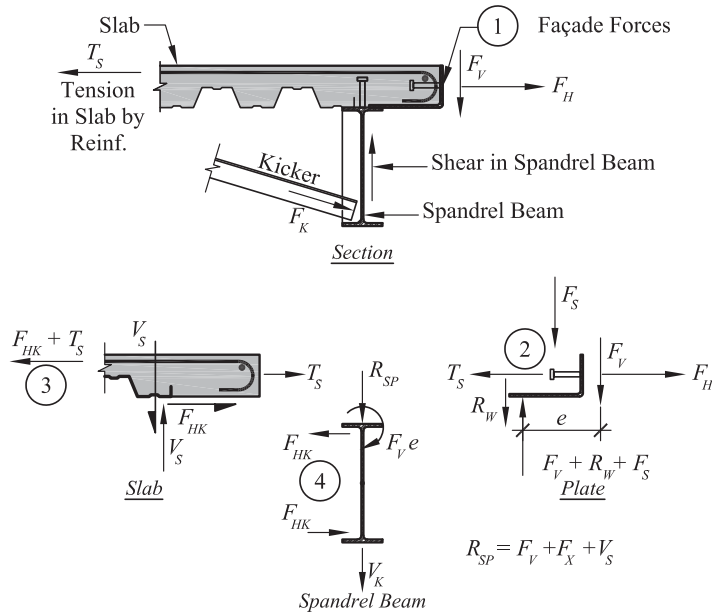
Concept where steel assembly forms pour stop and means to attach façade.
